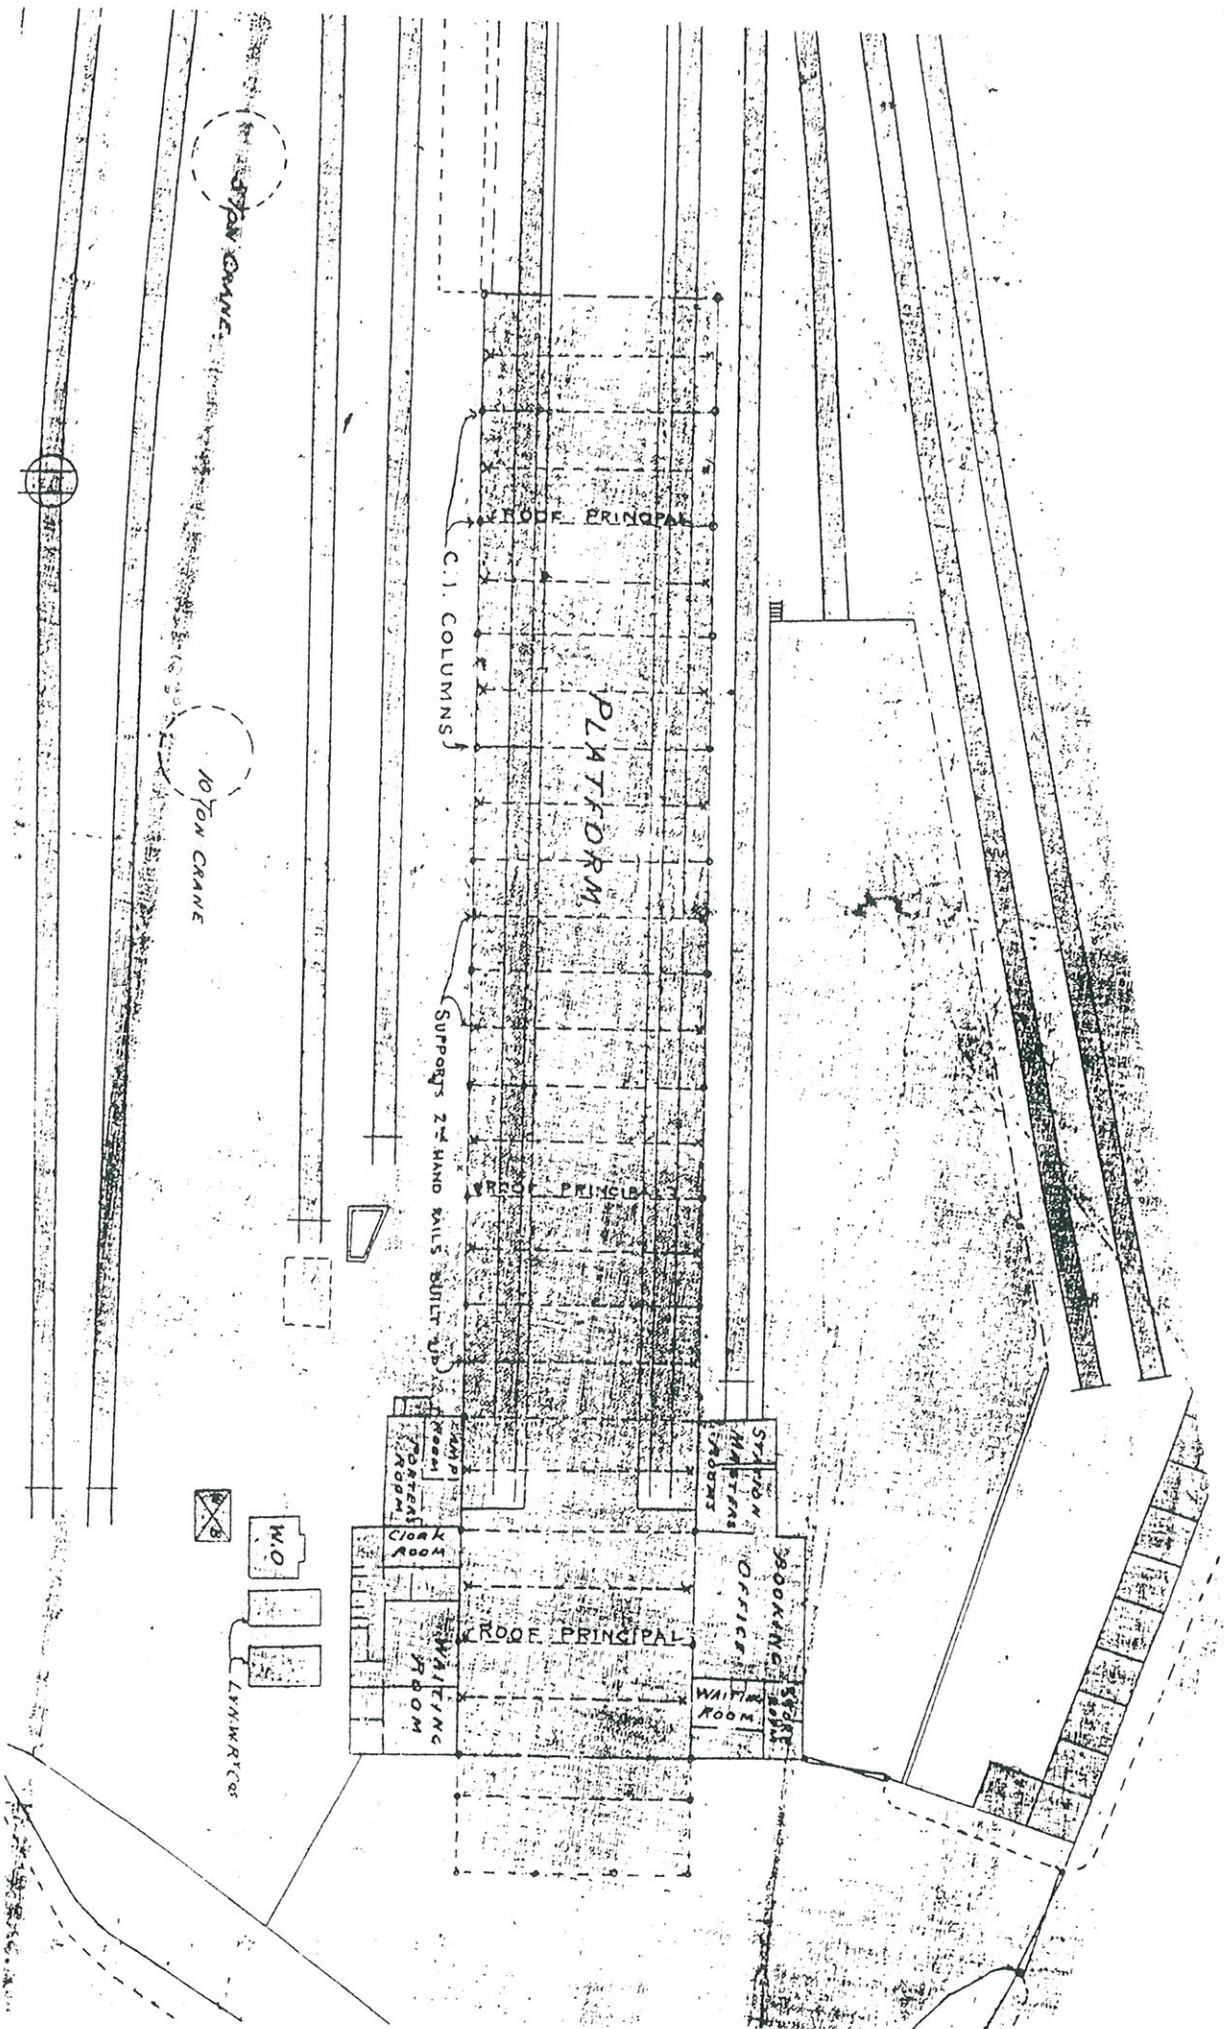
Plan of station yard in c.1900 (Railtrack)
